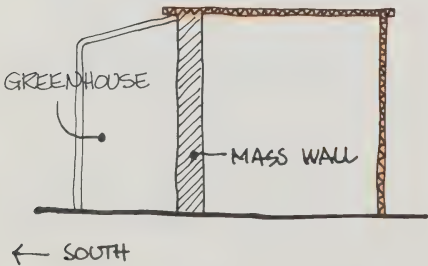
ATTACHED GREENHOUSE & MASS WALL
